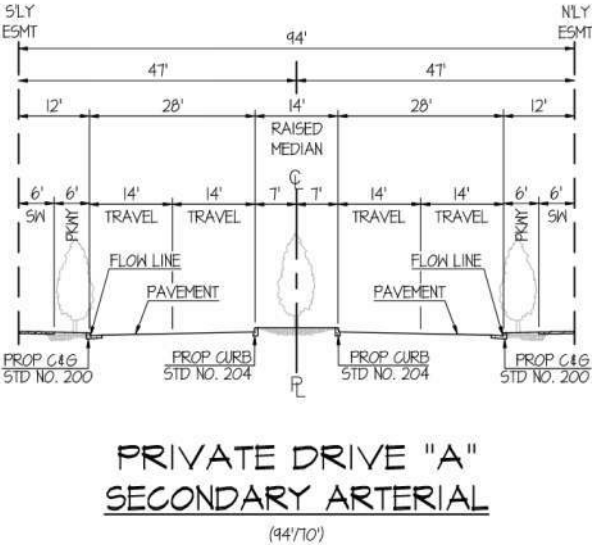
, Standard Street Sections – Private (Private Drive A)
